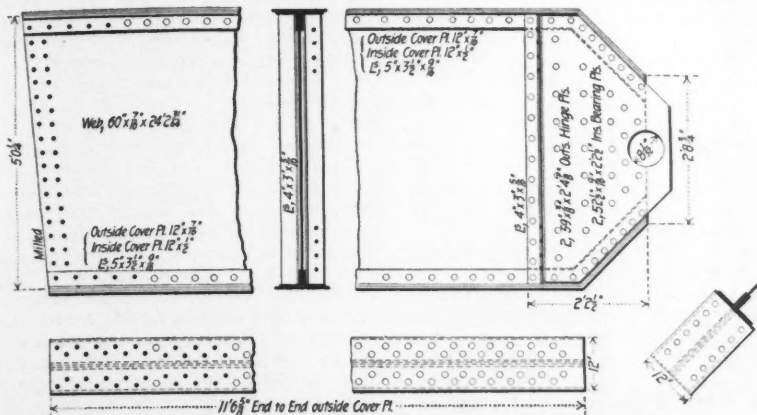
DETAILS OF PLATE GIRDER ARC RIBS AT SKEWBACKS.
